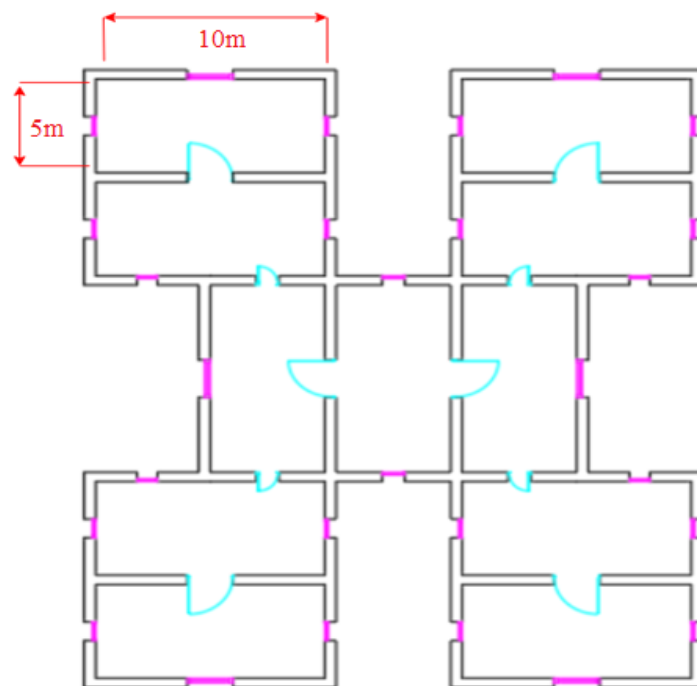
Floor plan (10 floors, 11 thermal zones per floor)
